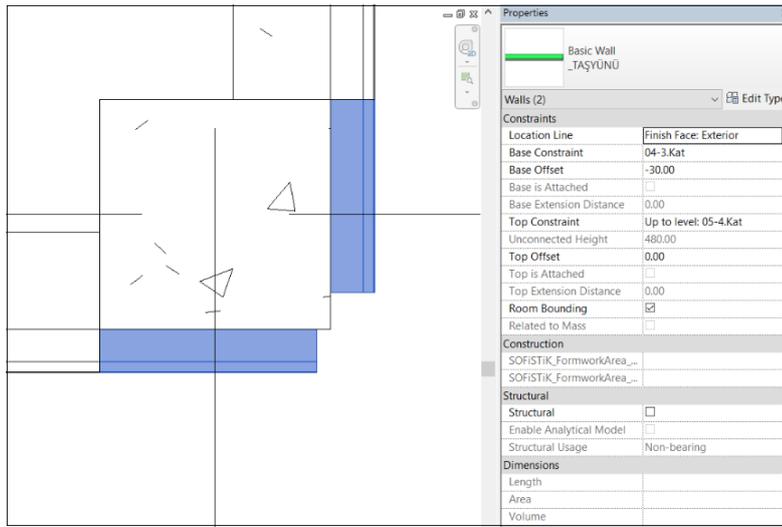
Elements after Deleting Split Sections in 2D Plan
